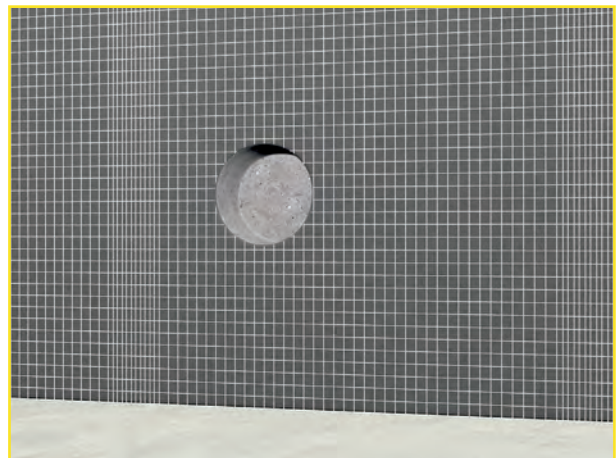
Wall openings – Example: Switch / socket – levelly cut off
